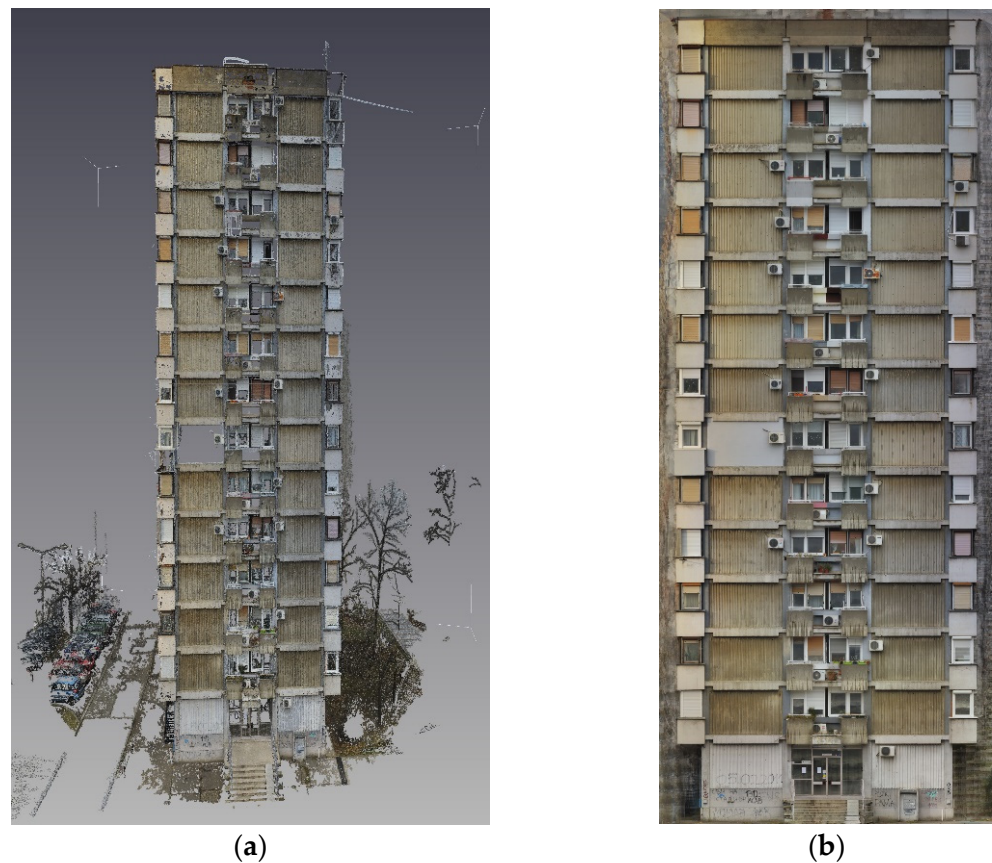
Southeast building façade: generated (a) point cloud with over 35 million points and (b) orthofaçade with an average GSD of 2.2 mm.
